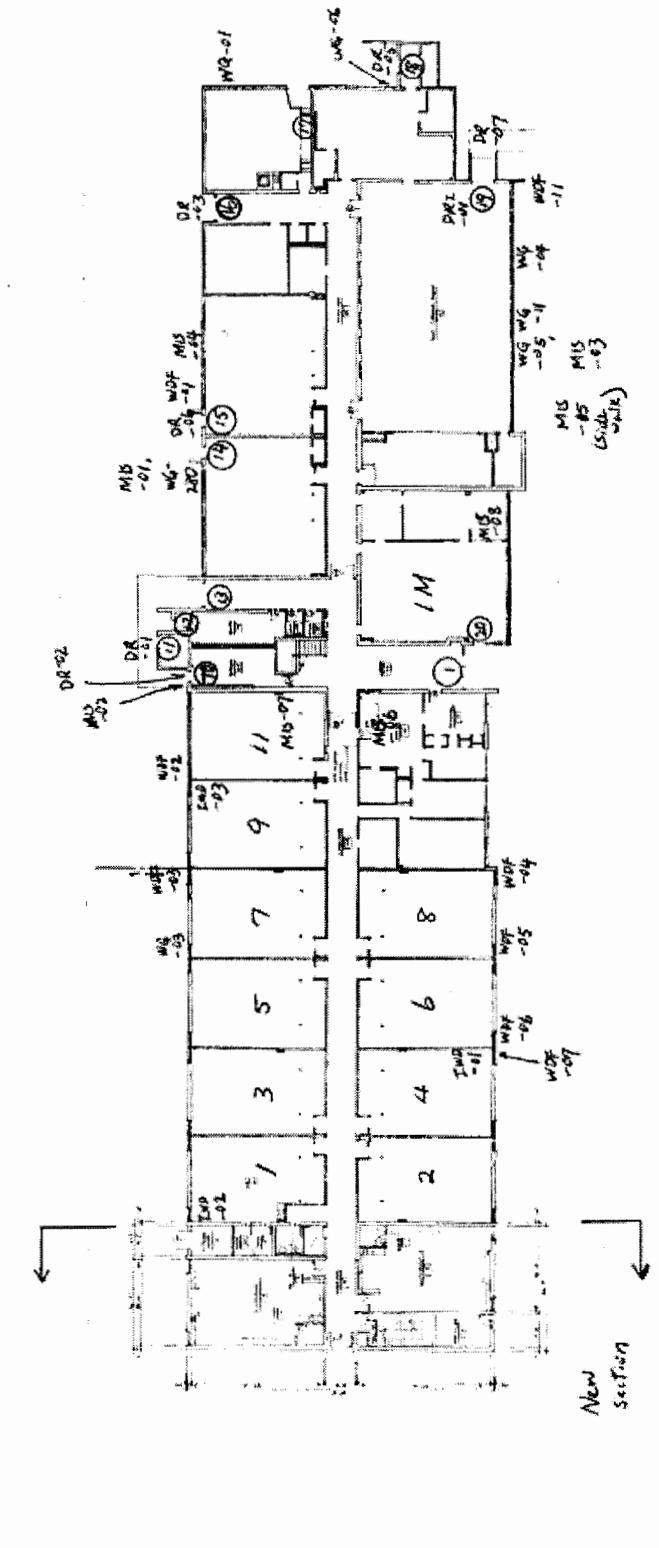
Farmland ES Floor Plan Showing Caulk Sampling Locations (First Floor)
